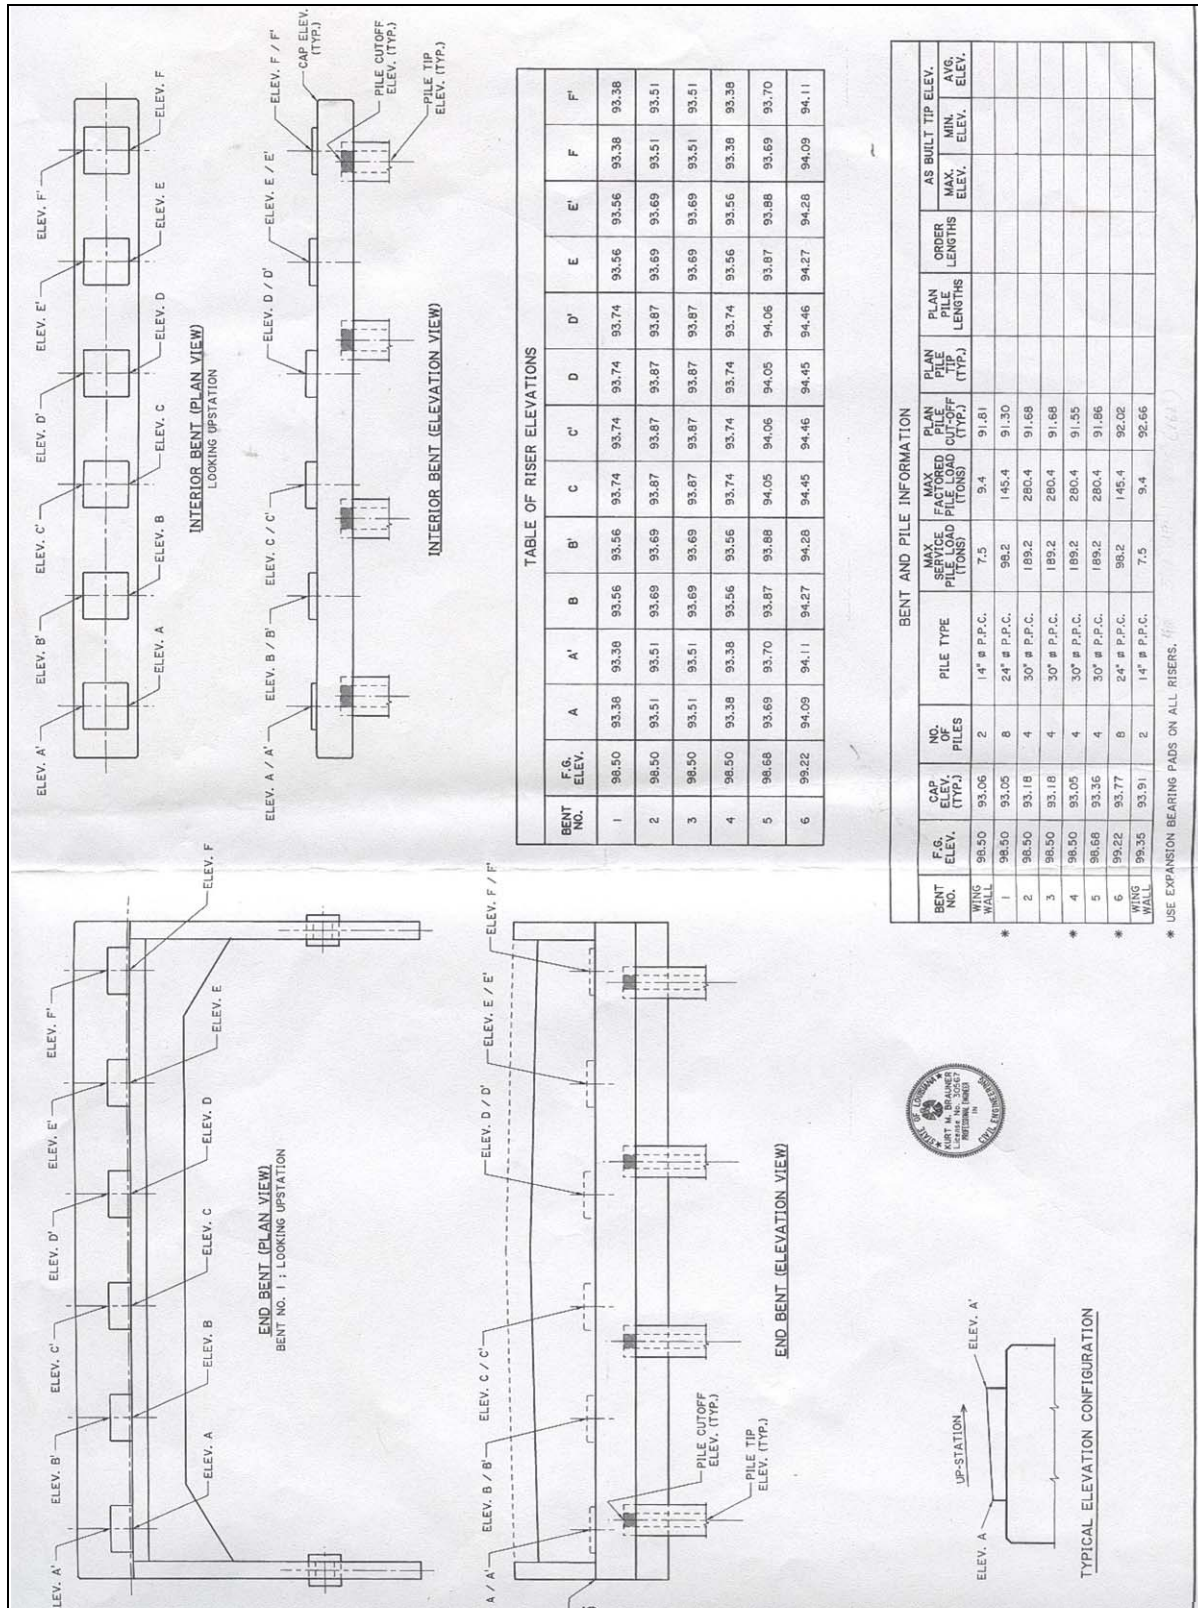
Table of elevation for Bayou Grape Bridge (Source: LA-DOTD 2002)
